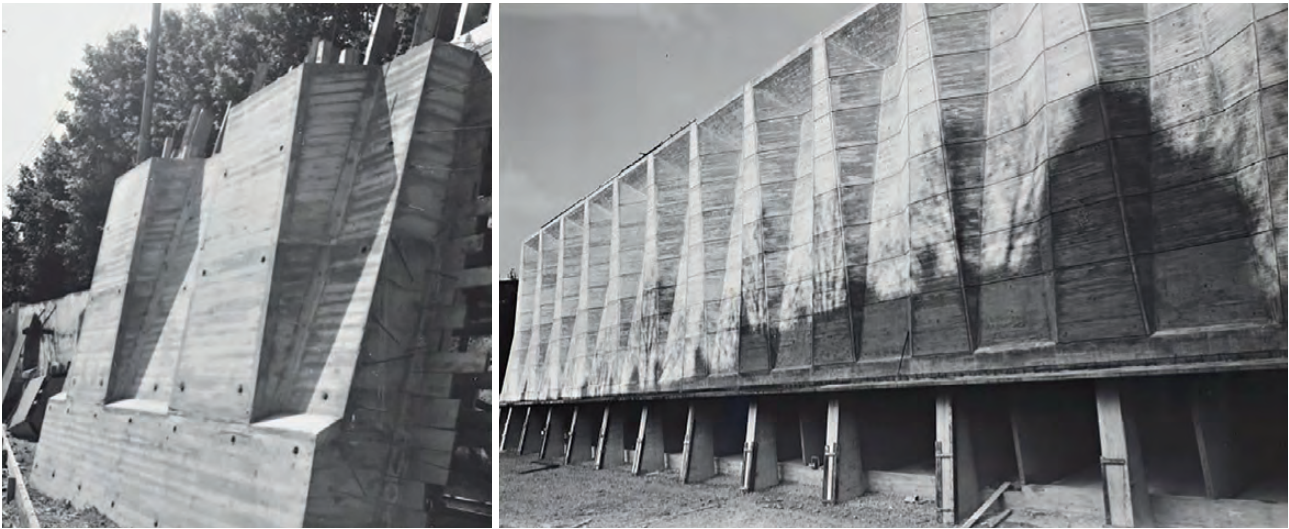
Folded concrete walls of the Conference Hall under construction, UNESCO Headquarters Paris. P.L Nervi, M. Breuer and B. Zehrfuss. 1955–58. L. Hervé.
